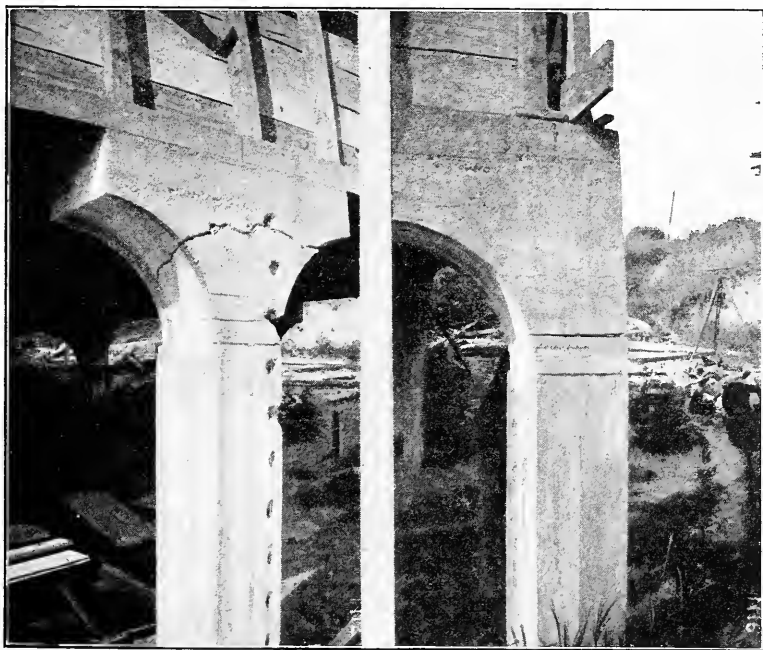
VIEW OF COLUMNS D5 AND E5 OF WORCESTER TEST STRUCTURE WITH MAXIMUM LOAD IN POSITION.
